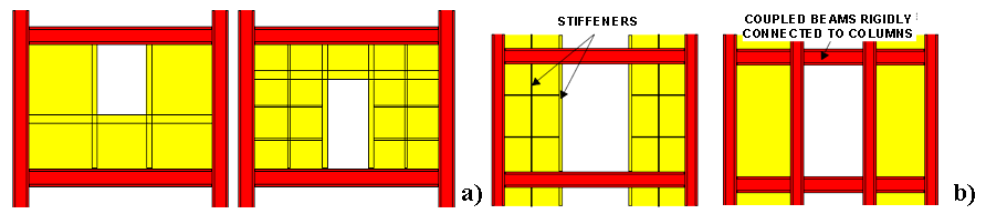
Presences of openings in simple steel plate shear walls (a) and adoption of coupled steel plate shear walls for openings realization (b)
